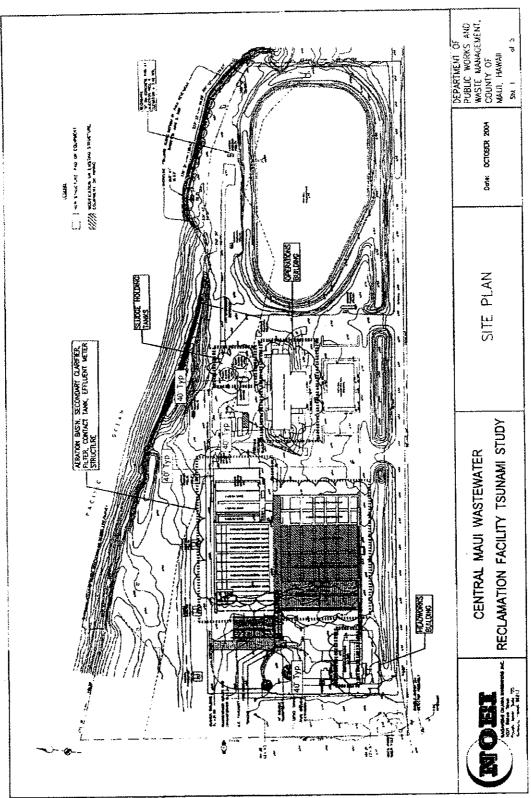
Plan view of the wastewater treatment facility; red areas to be "hardened".
